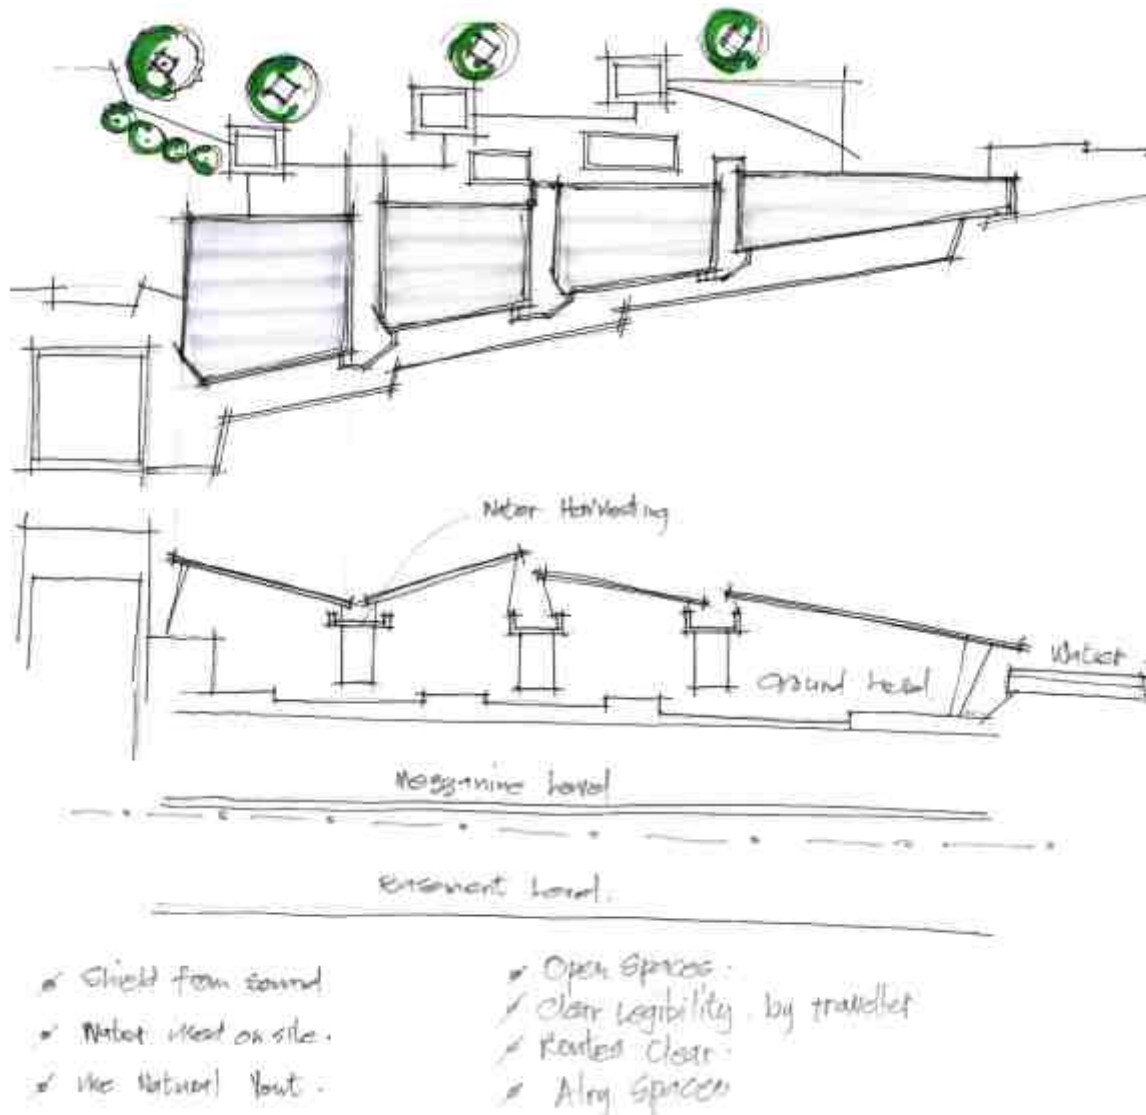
Early concept sketches of the possibility of harvesting rain water from roof surfaces. This entailed the use of mono pitch roof surfaces, which however couldn't be successfully utilised because of the enormous scale of the building intended.
